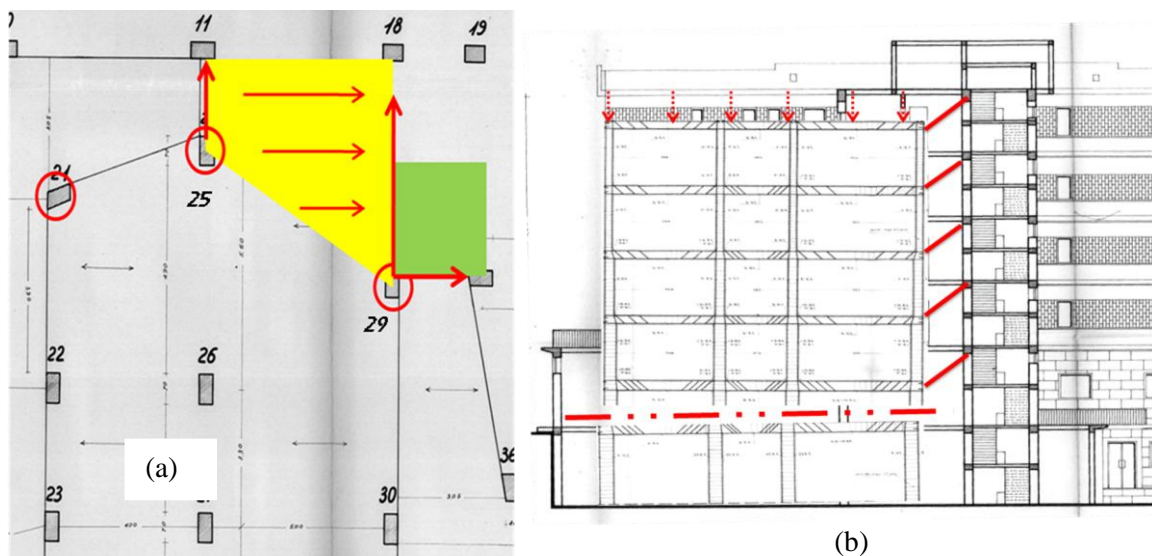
Collapse mechanism: (a) plan of the collapsed region at a typical floor; (b) view in N-S direction.
